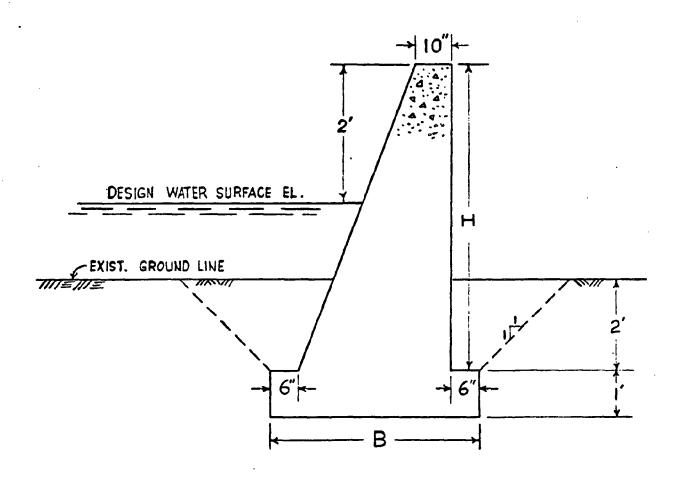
TYPICAL GRAVITY FLOODWALL CROSS SECTION
